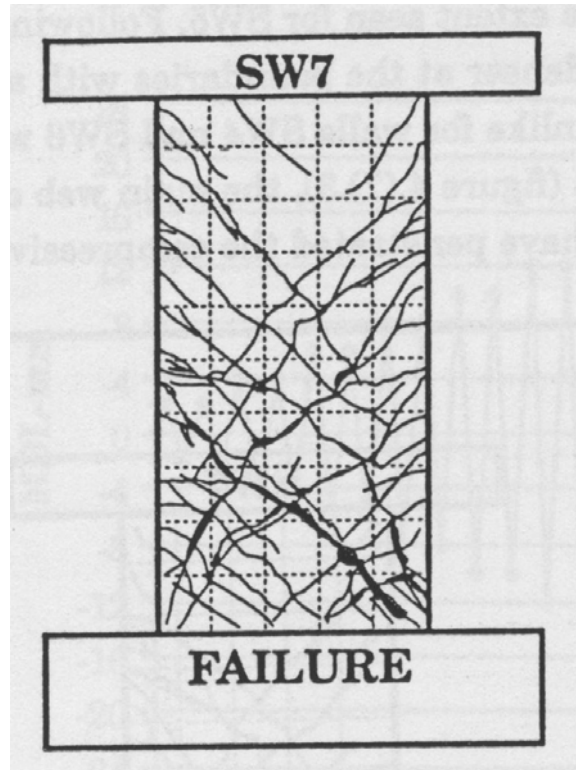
Condition of wall SW7 at 1.83% drift [Pilakoutas (1991)]
